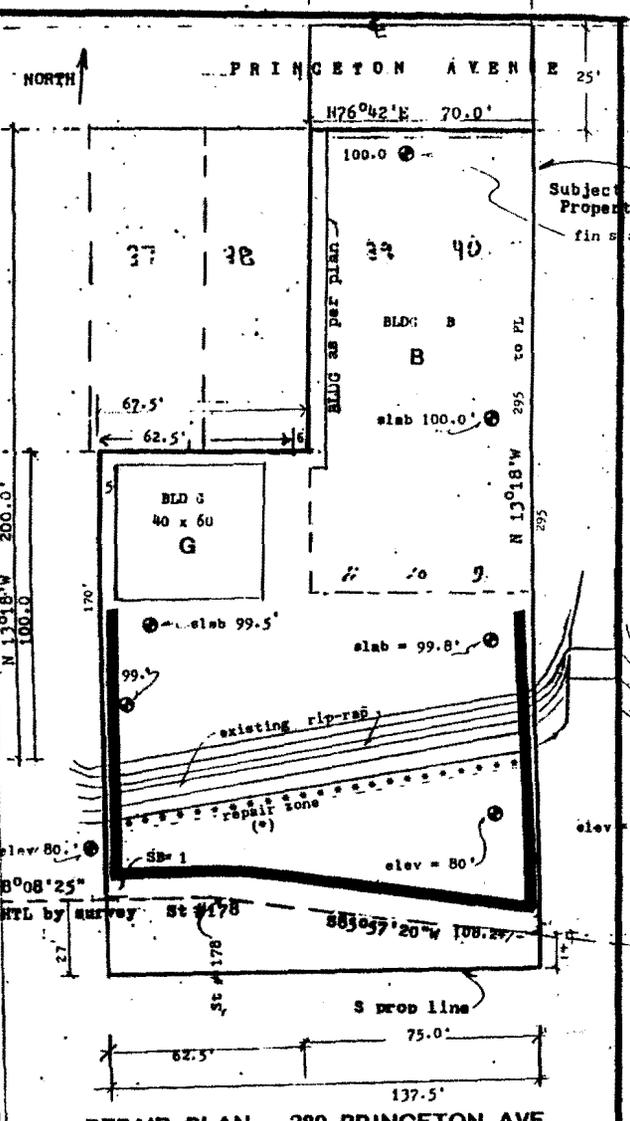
REPAIR PLAN 380 PRINCETON AVE
